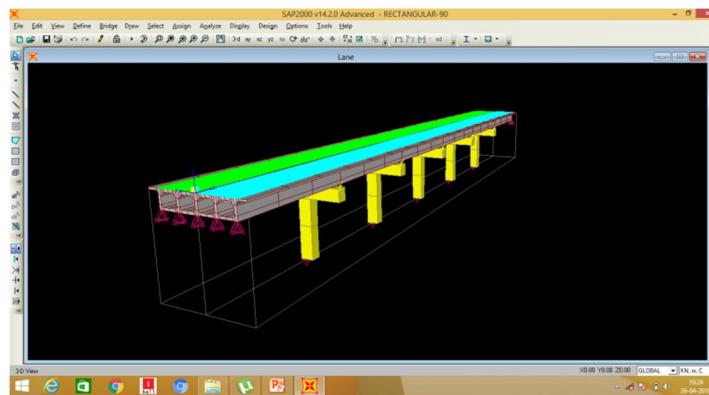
Finite Element model of Rectangular box girder bridge Superstructure created in SAP 2000
